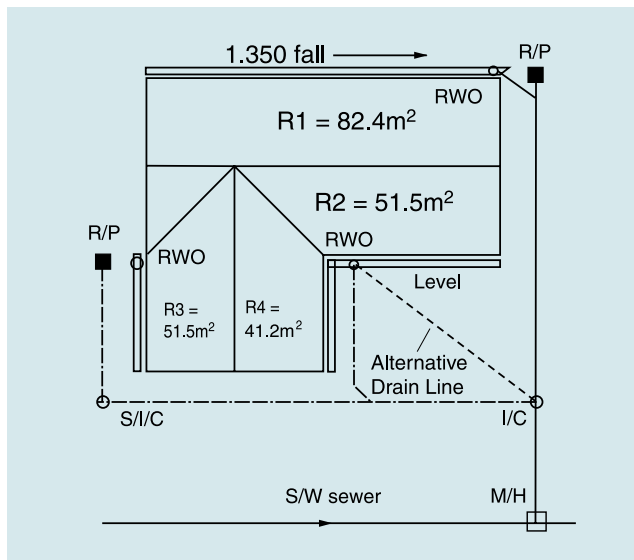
shows feasible outlet positions, gutter installation, roof area, and possible drainage layout.
